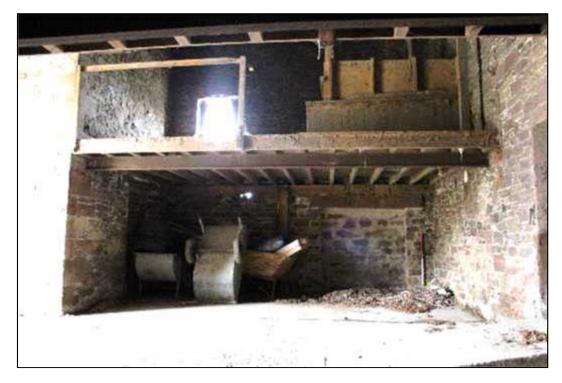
Interior of Building B, northern extent, showing lintel above recessed area
